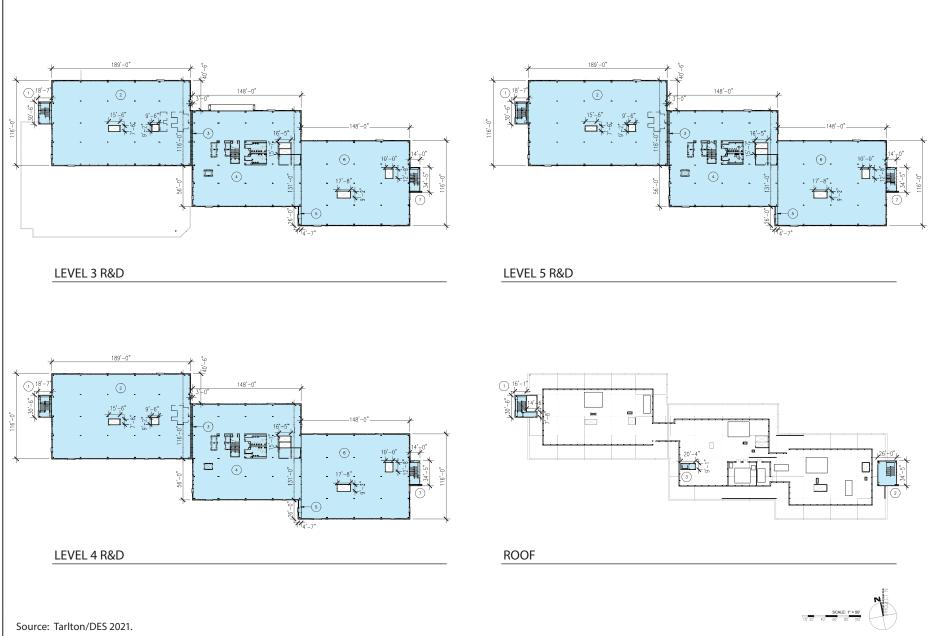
Site Plan by Floor (Level 3 R&D through Roof) 1350 Adams Court Project A truck loading dock would be on the south side of the building and screened from the street by vegetation and the PacBio facility. It is anticipated that two to six truck deliveries would be made each weekday. The service drive aisle would provide connectivity to parking on the east and west sides of PacBio. Adams Court currently ends at a chain link fence; a gate provides emergency vehicle access as well as intermittent access for vehicles traveling to/from the Menlo Science and Technology Park to the west. However, as part of a separate project (i.e., the Willow Village Master Plan Project), an access point could be provided at Adams Court, as indicated in ConnectMenlo, allowing traffic to flow from a new street just west of the property. Although not part of the Proposed Project, this analysis will consider scenarios with and without this access point. The potential future connection of Adams Court to the Menlo Science and Technology Park is identified on the City's adopted zoning map.
